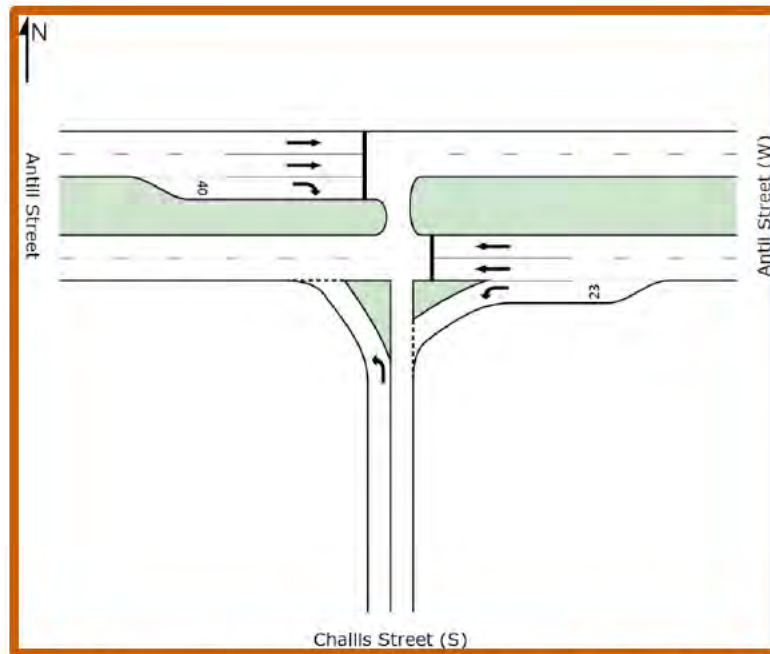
Recommended Layout for the Intersection of Antill Street and Challis Street
